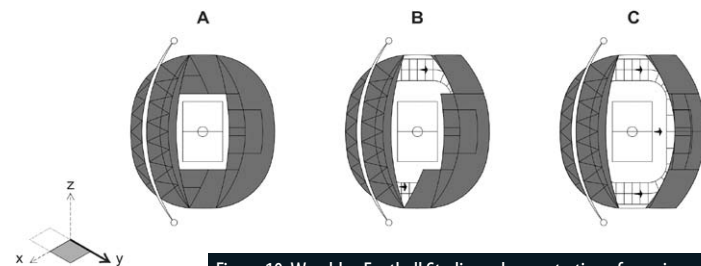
Wembley Football Stadium; demonstration of opening and closing a rigid roof structure (A - closed, B - half-open, C - open).
